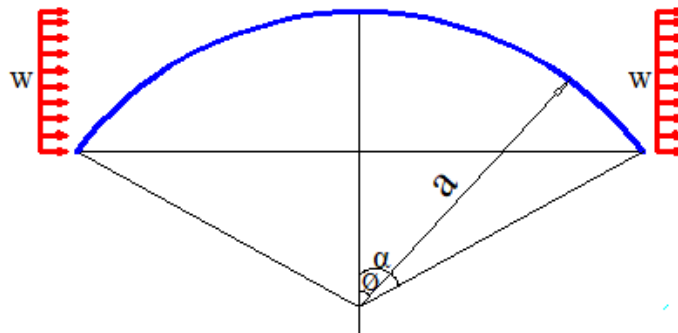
7: Spherical concrete shell subjected to wind load sectional view
